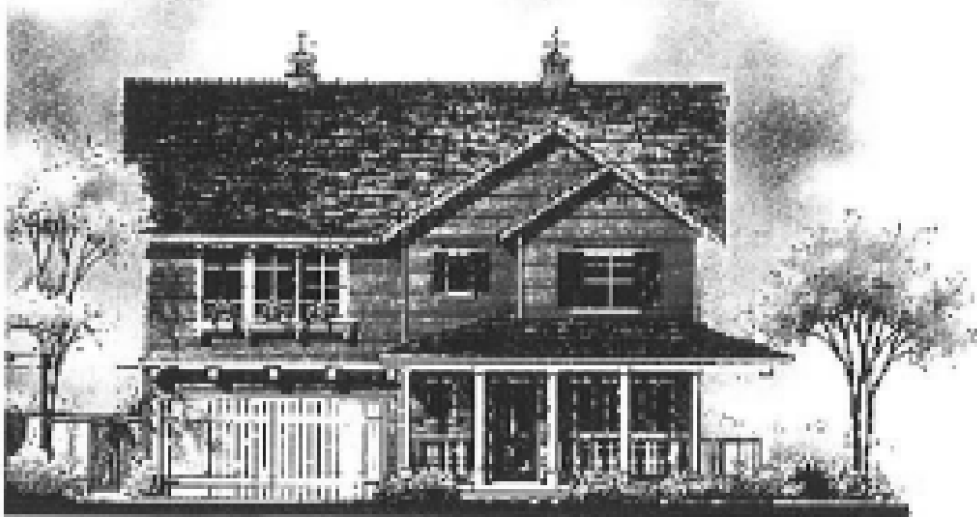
PLATE VI – EXAMPLE OF AMERICAN FARMHOUSE STYLE
